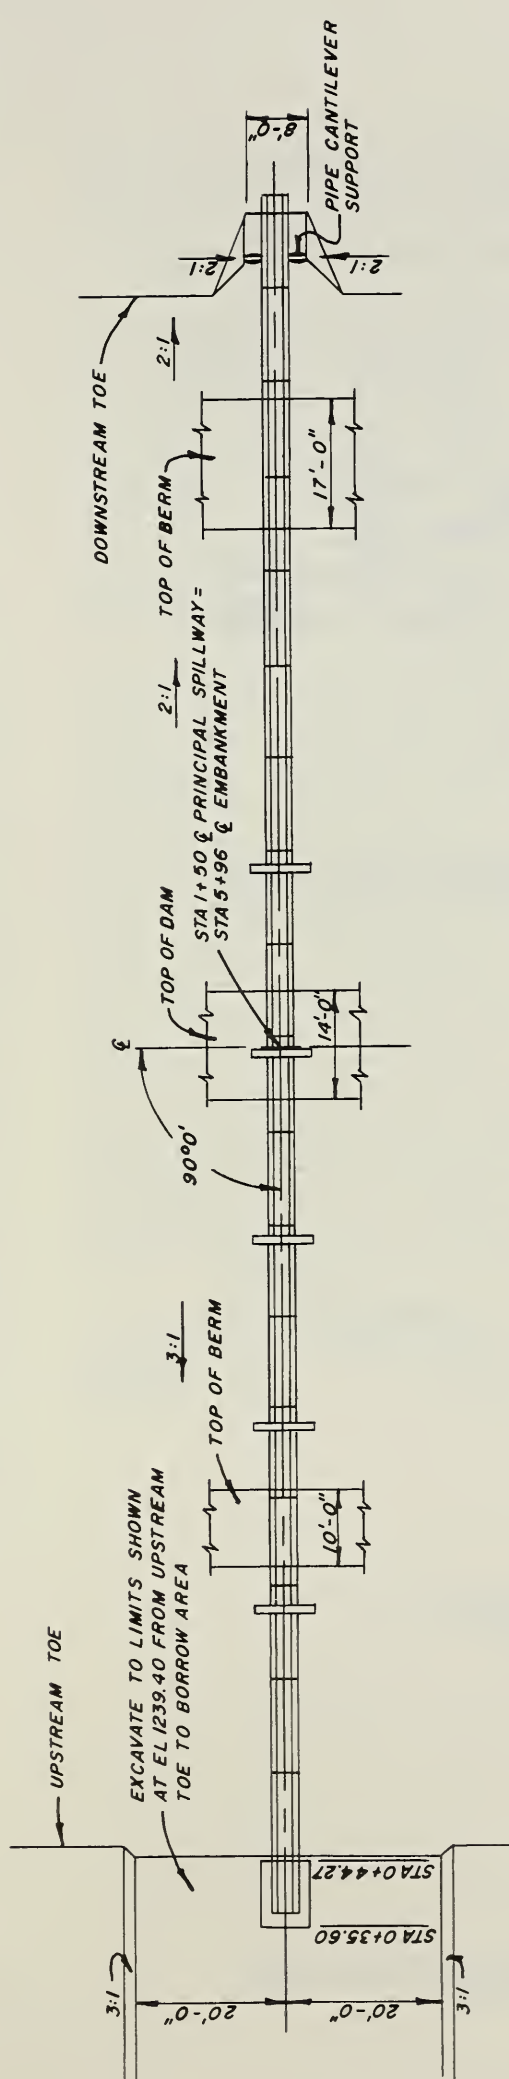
PLAN OF PRINCIPAL SPILLWAY
